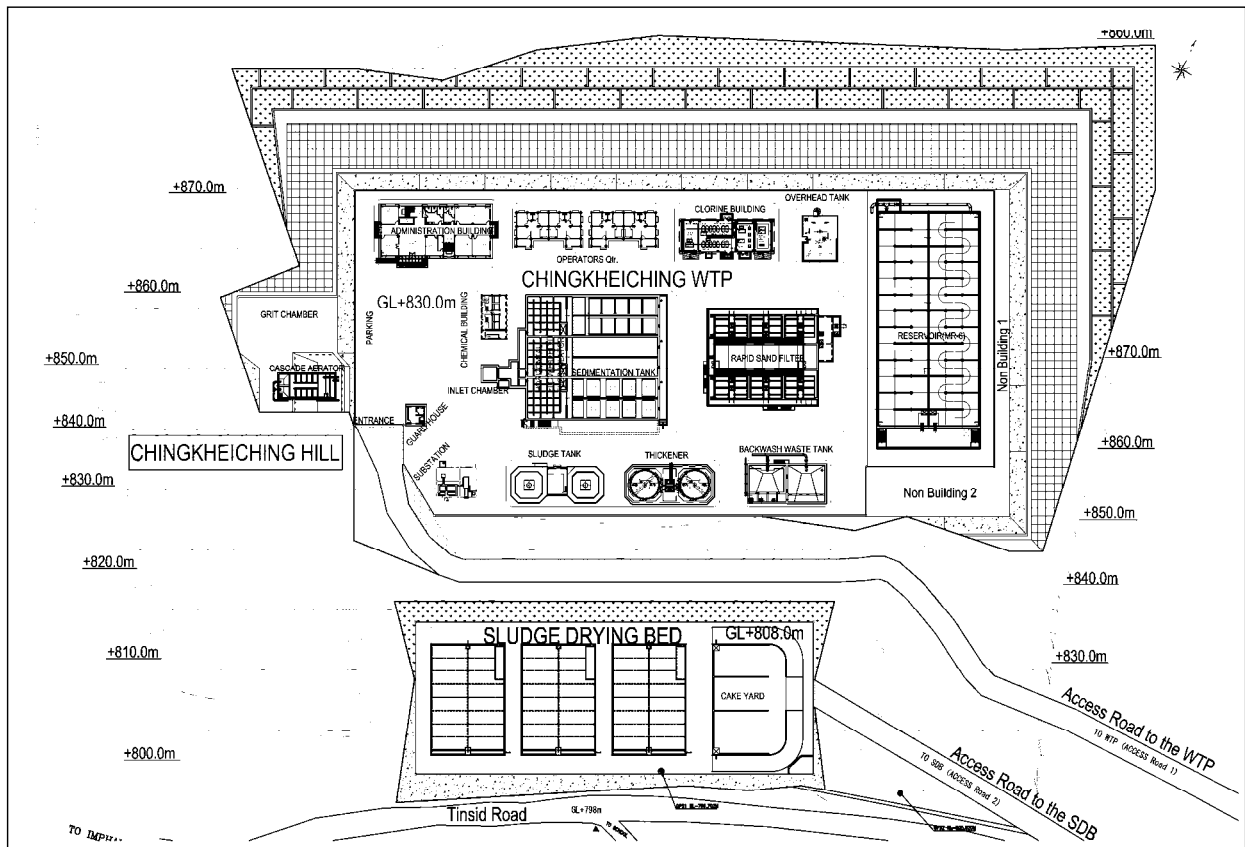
Proposed Site Layout of Chingkheiching WTP
